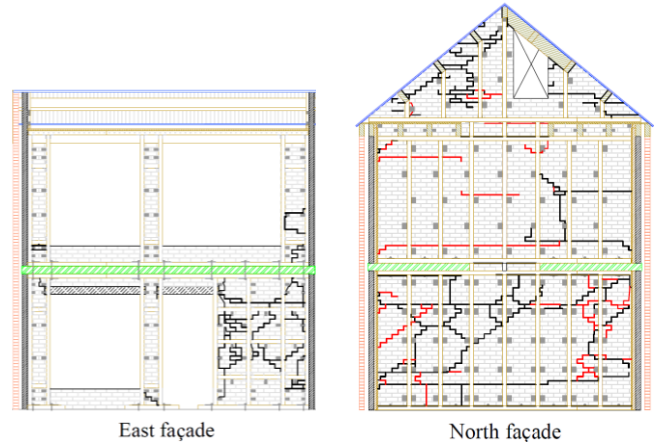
Retrofitted building crack pattern at ultimate conditions: CS inner leaves.
